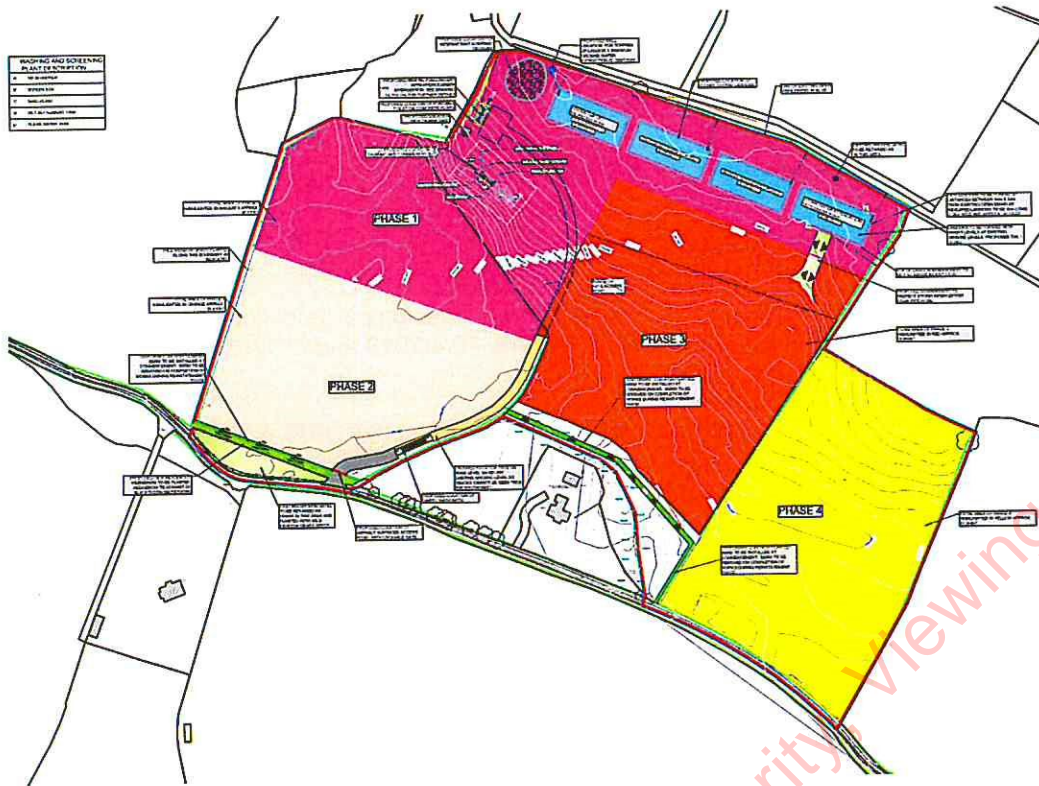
Site Layout Plan (Ref: extracted from the planning drawings)
